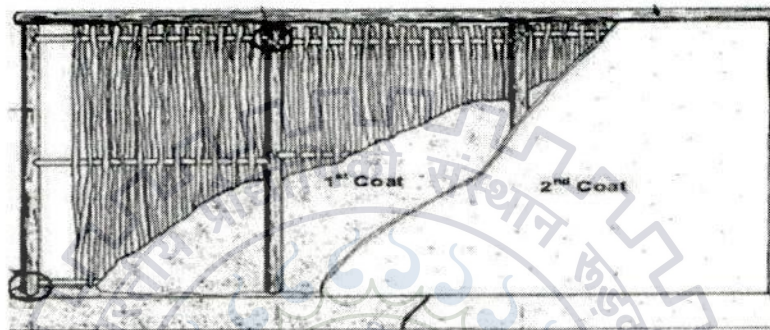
Ikra wall elevation (Source: Maulik D.K et al. 2011)
